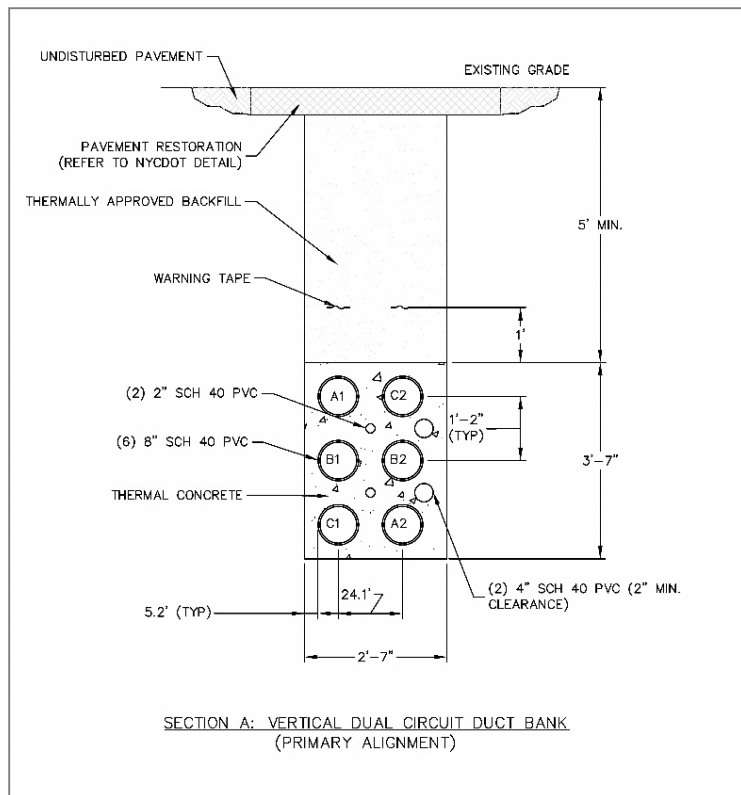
Typical duct bank for the Astoria Rainey cable, to be installed 8.6 feet below the present road surfaces. Taken from Langan 2023, Sheet CS501.
